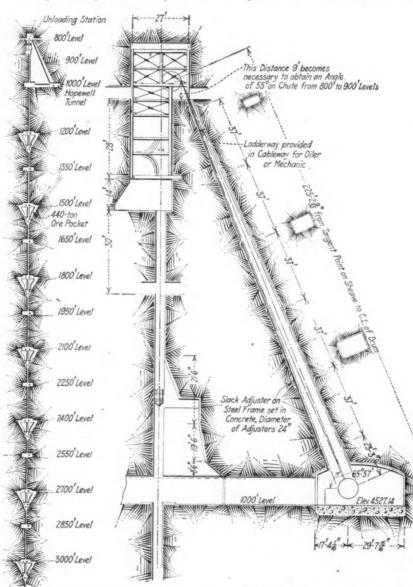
VERTICAL SECTIONS SHOWING GENERAL ARRANGEMENT OF SHAFT AND DETAILS OF HOISTING AND DUMPING EQUIPMENT
